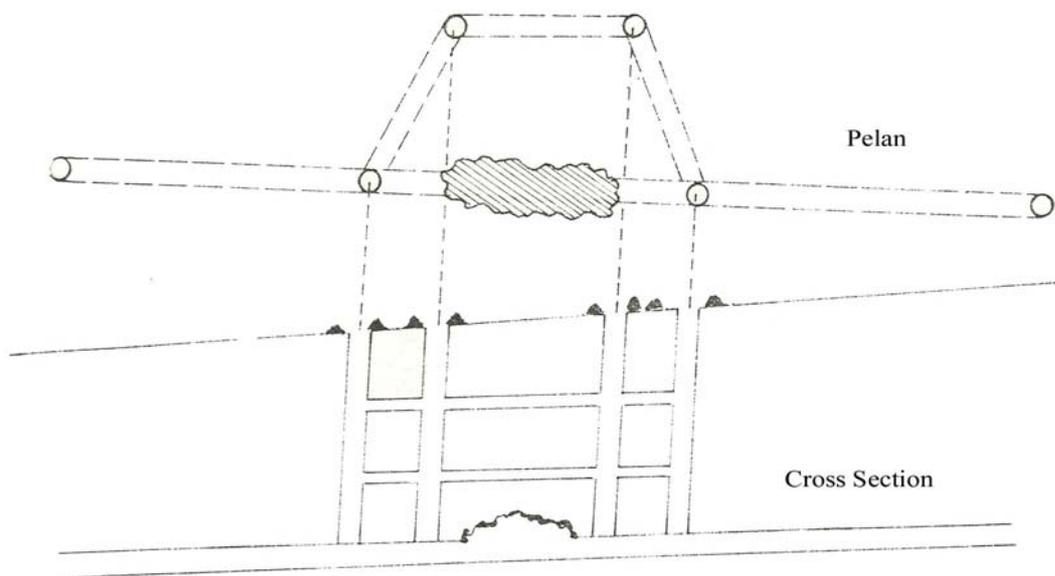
, Method of removing an obstruction, when water has built up in tunnel and some shafts
